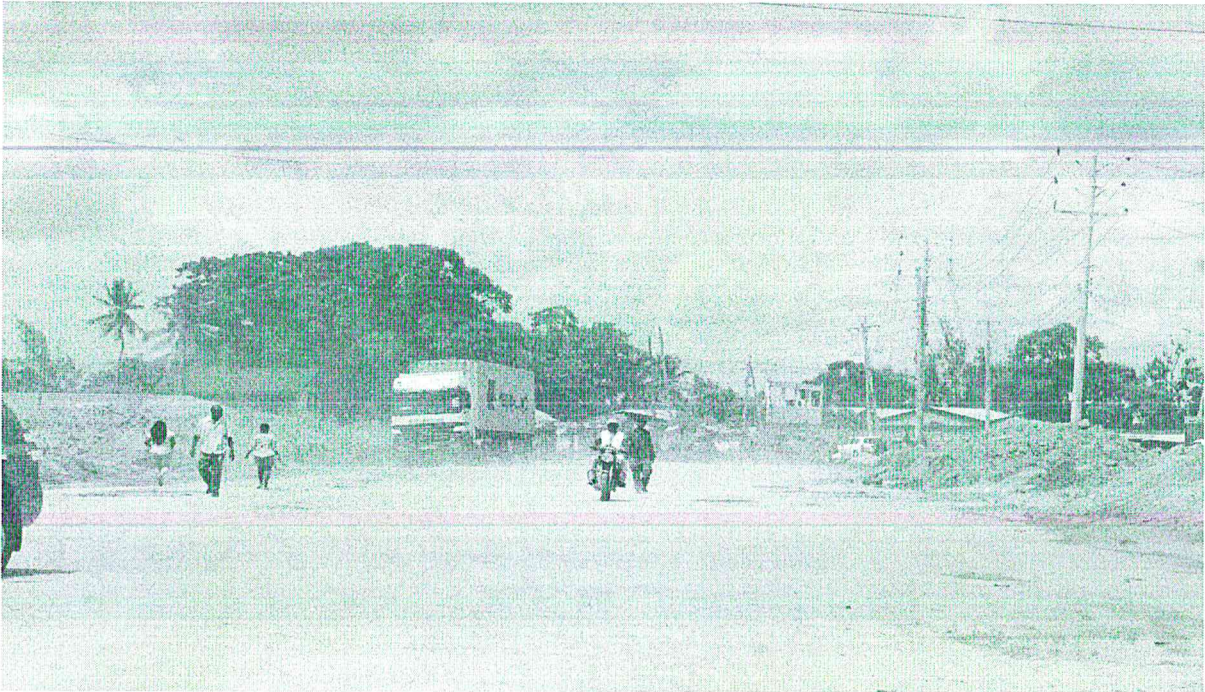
Incomplete sections of the road project at Kwa Jomvu area
